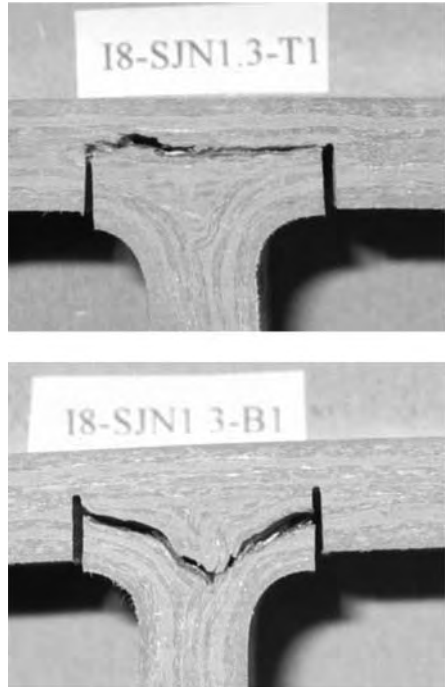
Shear failure modes of the top and bottom web-flange junctions of 203 × 203 × 9.5 mm pultruded GRP WF profiles.
